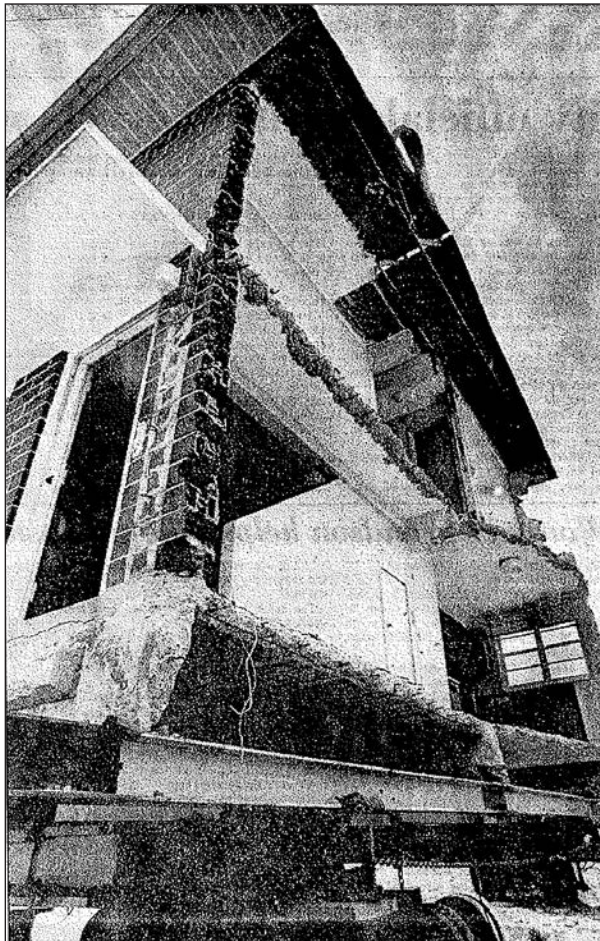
Photograph from the Macon Telegraph and News, March 30, 1989 of building being moved from the Tindall Heights Extension along Elizabeth Street to its final location near intersection of Elizabeth and Tindall Streets. Courtesy of the Macon Housing Authority Archives.
